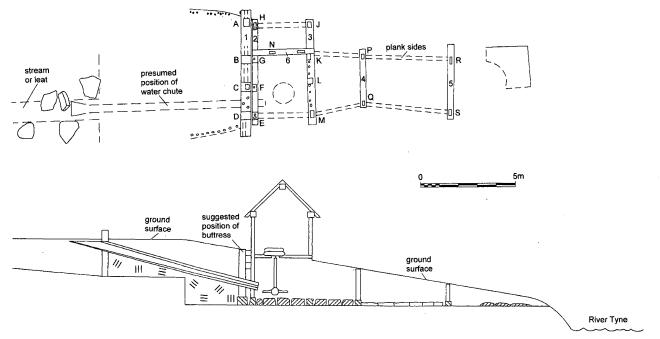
Suggested reconstruction of the modified watermill at Corbridge. Scale 1:200.
